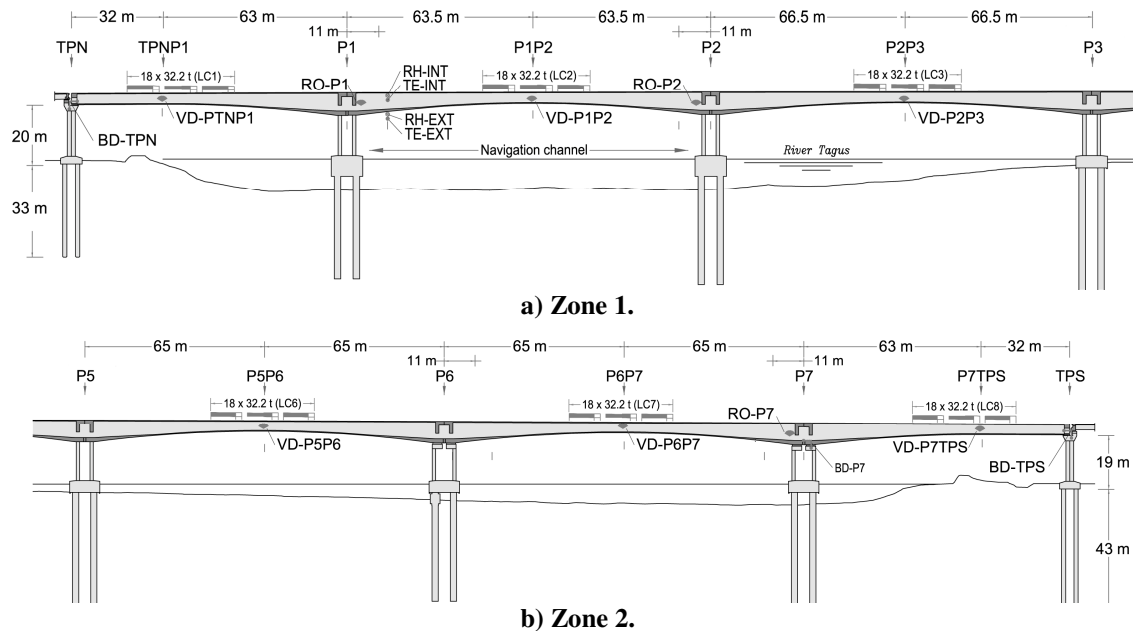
Elevation of the main bridge zones intensively instrumented.
